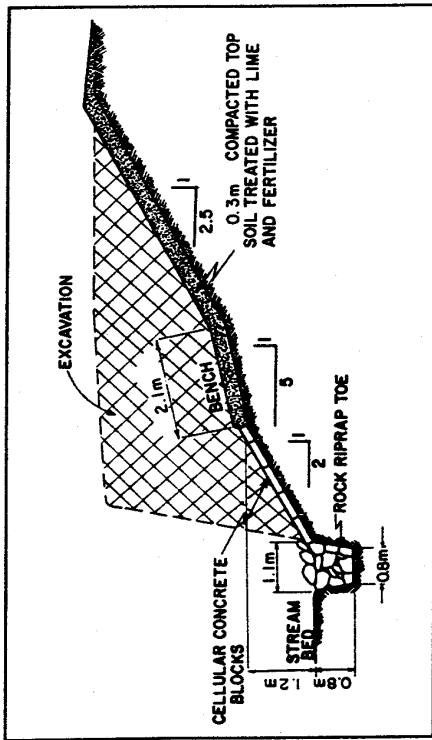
Johnson Creek Study Reach No. 2: Cross section of excavated bench, with lower bank and entrenched toe protected with structural materials
